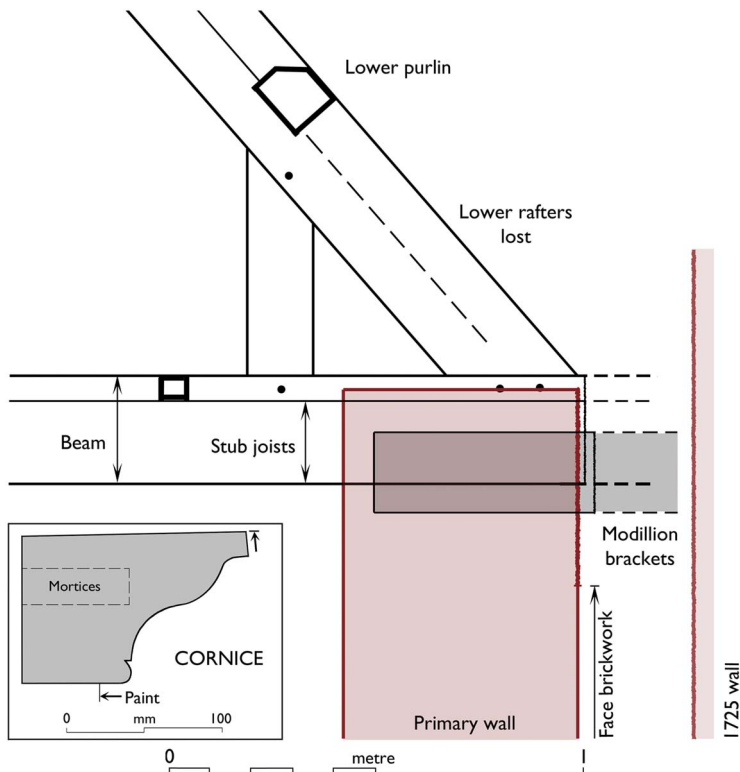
Moor Park: section through head of east wall. Inset: section of oak cornice reused in the alterations of *c* 1725 to the roof, probably the upper member of the eaves cornice. *Drawing:* Paul Drury
